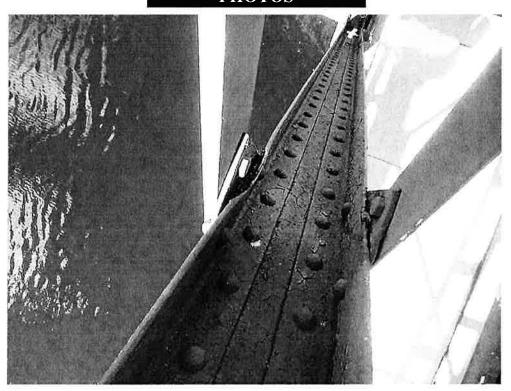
South tower inner truss, members U4-L2 at M3 – outer flange has section loss at the edge.
